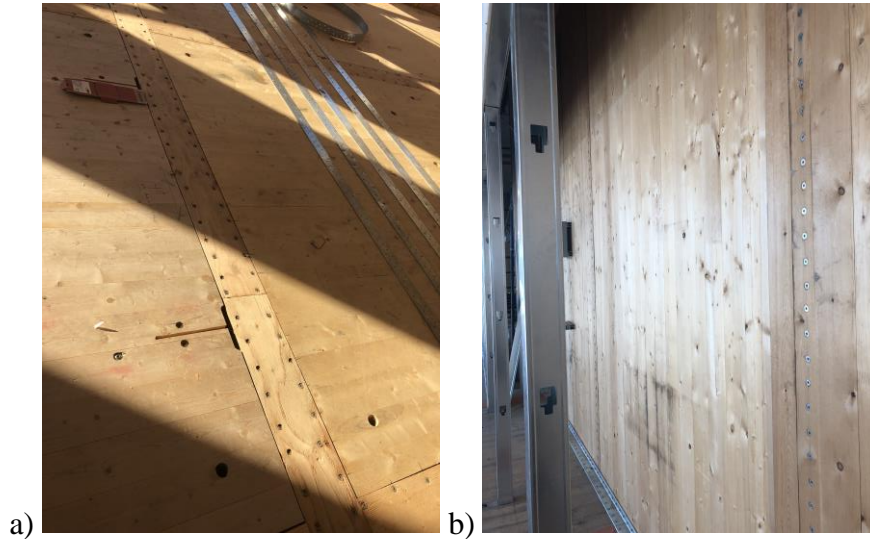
Typical CLT building showing various connections between floor and wall panels
